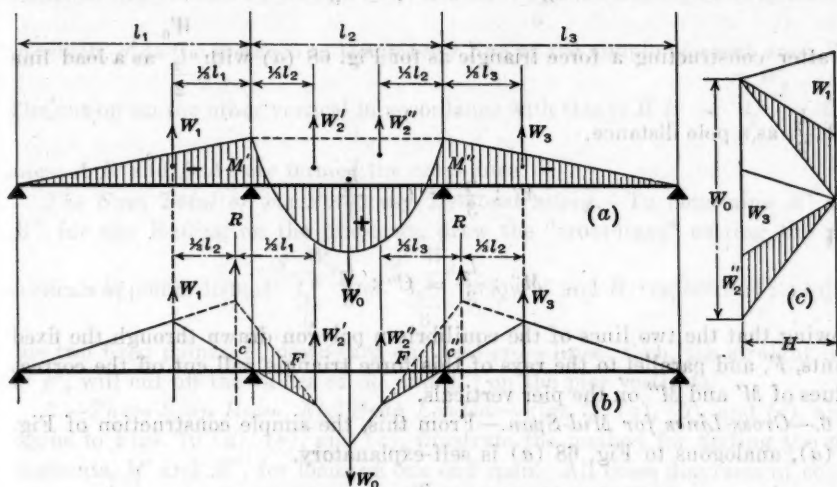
THREE-SPAN BEAM, MID-SPAN LOADED.
